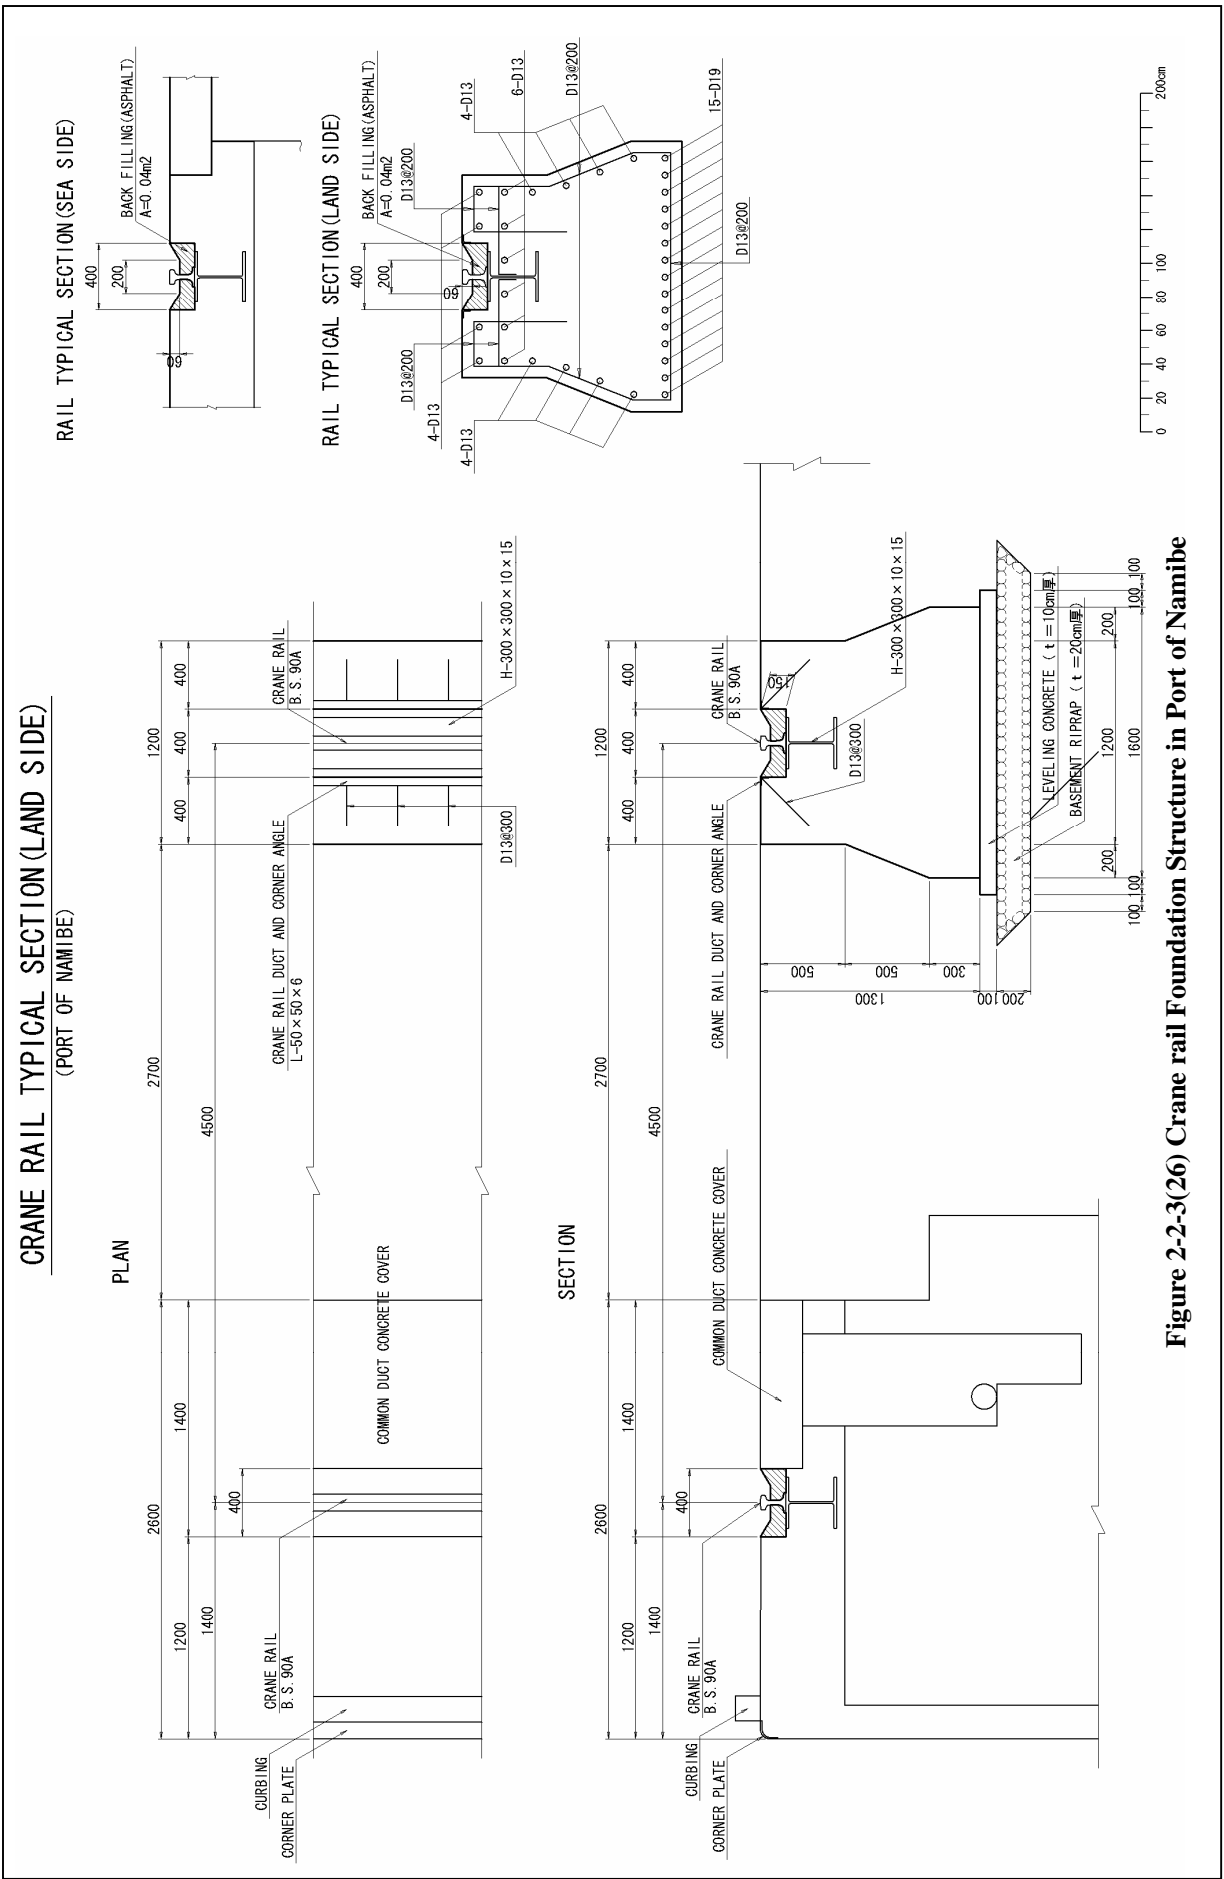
(26) Crane rail Foundation Structure in Port of Namibe
